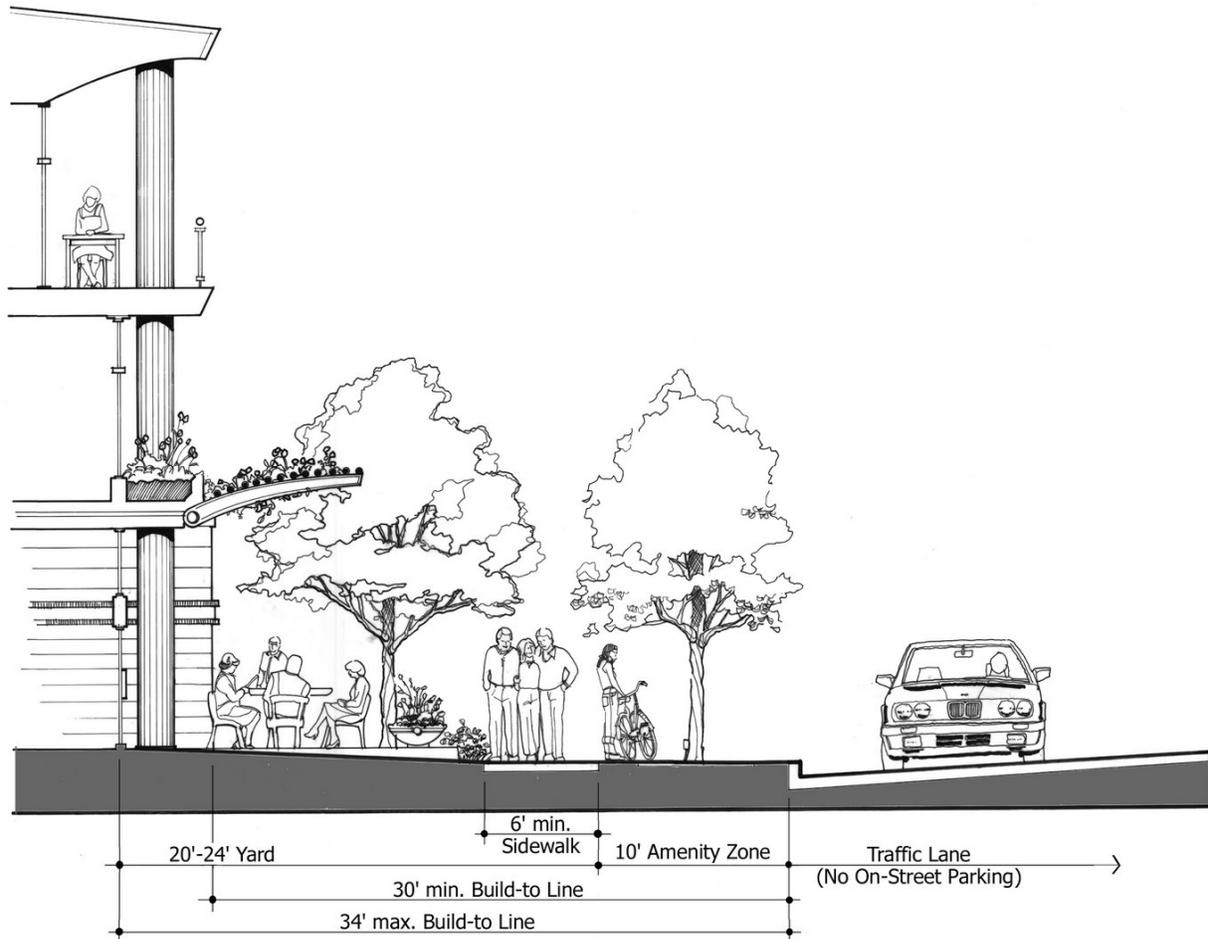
Street section, arterial streets and Greenville Avenue
